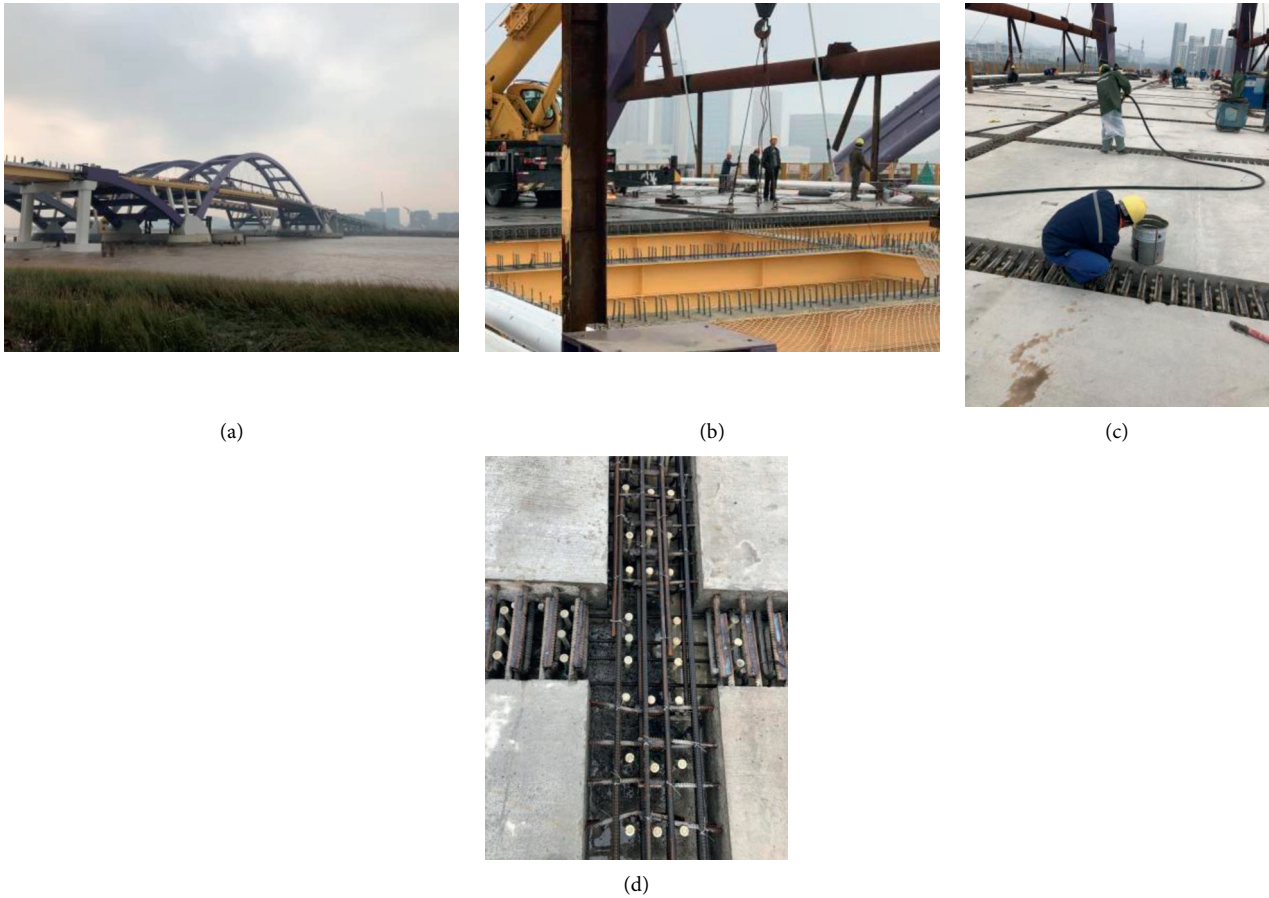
Photos of the construction site. (a) Xincheng bridge. (b) Bridge deck construction. (c) Wet joint. (d) Details of the wet joint.
